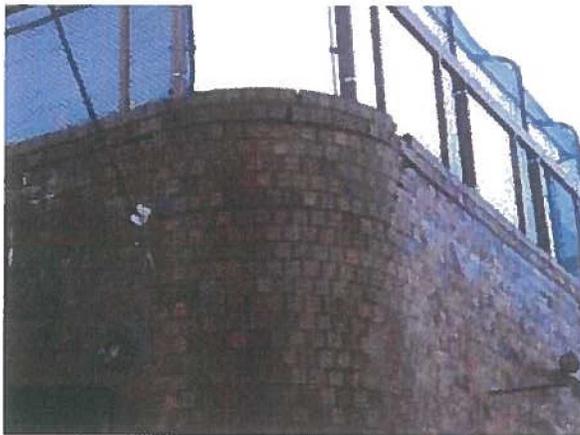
Above represents the significant displacement and cracking of the brick veneer on the south and west exterior walls of the school's Boiler Room building.
